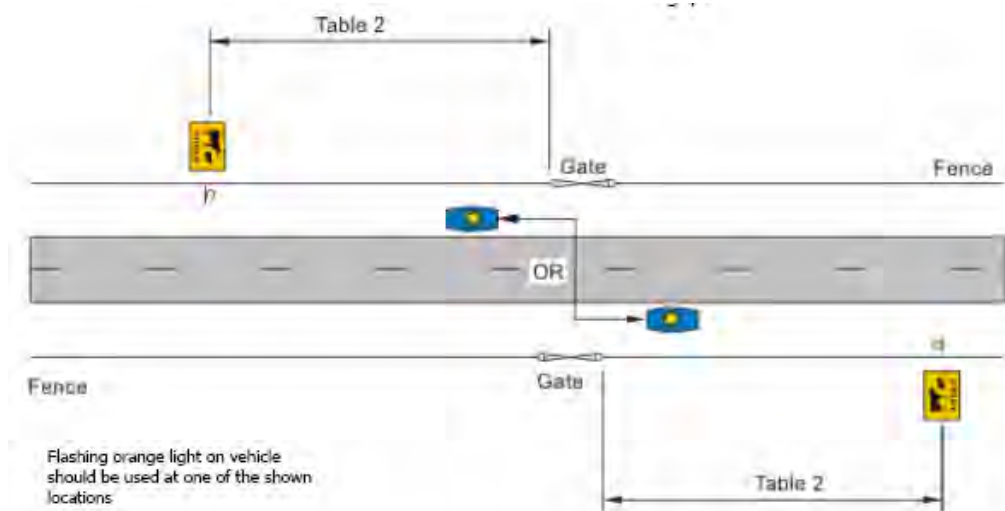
Typical Stock Crossing Site – for bitumen roads.
